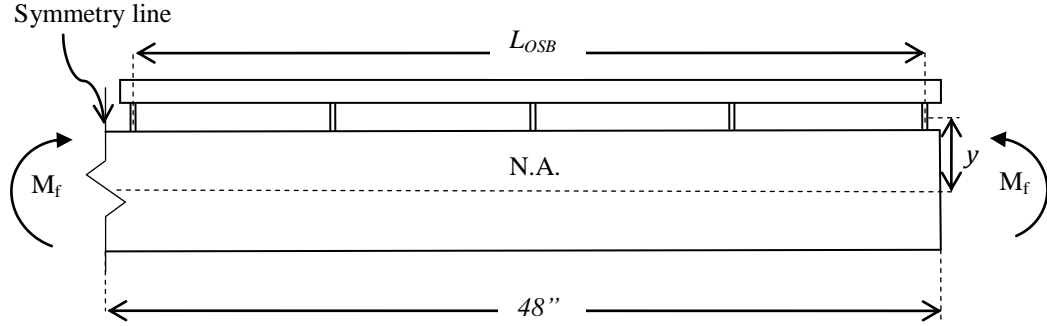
Joist/sheathing model to estimate forces at nails.
